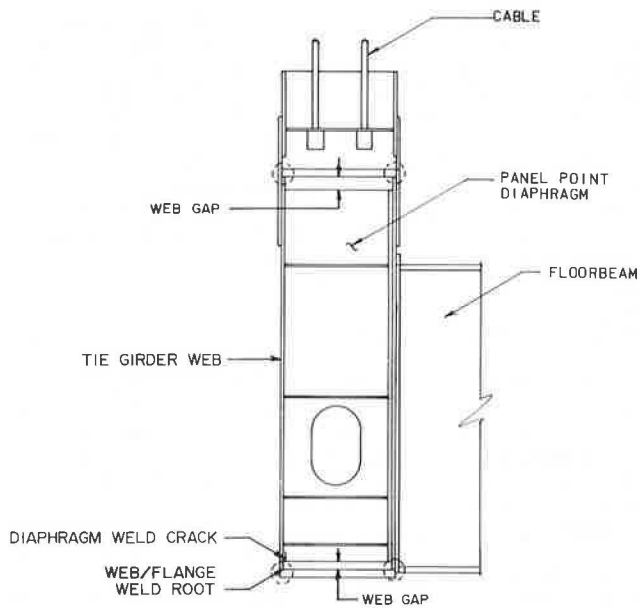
Web/flange weld root fatigue cracking.
